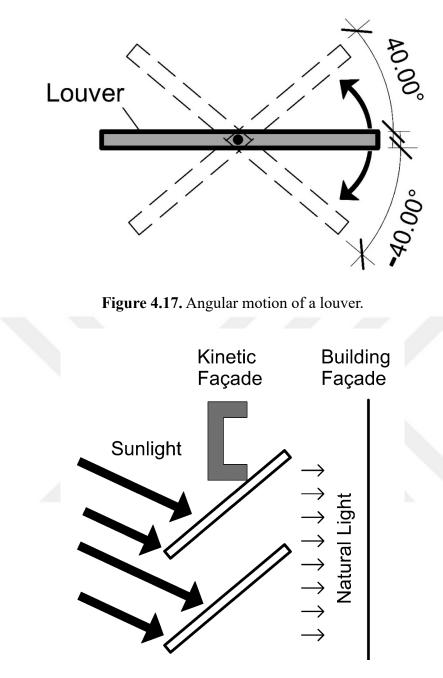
Natural light on the façade of the building. Sunlight reach the kinetic façade from right across.
